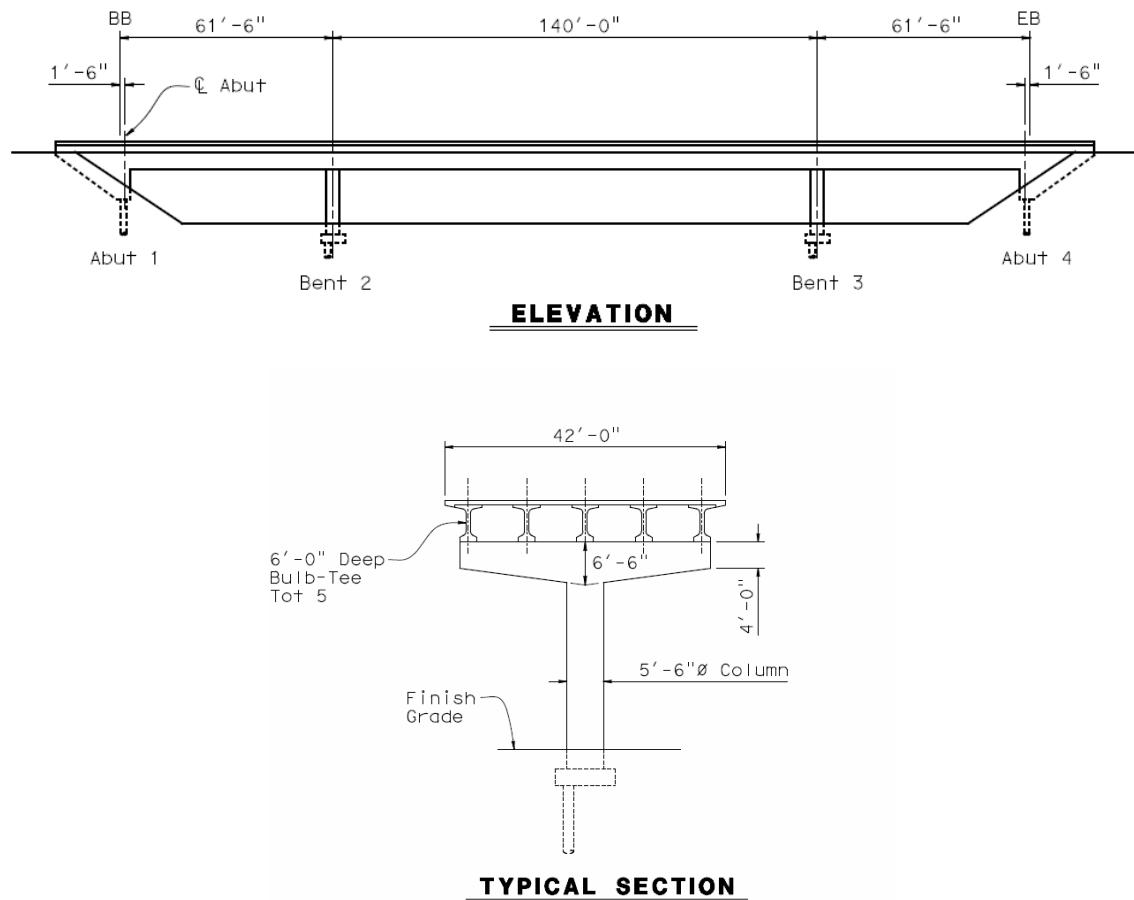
Precast Concrete Girder Made Continuous with a Composite Deck
